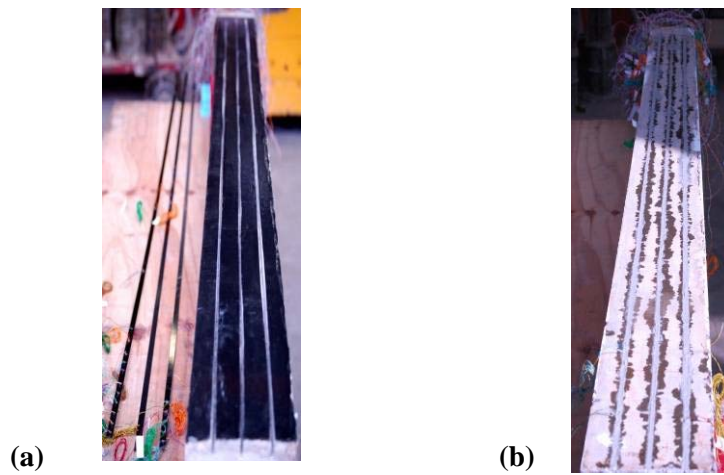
Restoration of partly failed beam for future testing, beams (a) before and (b) after strengthening
